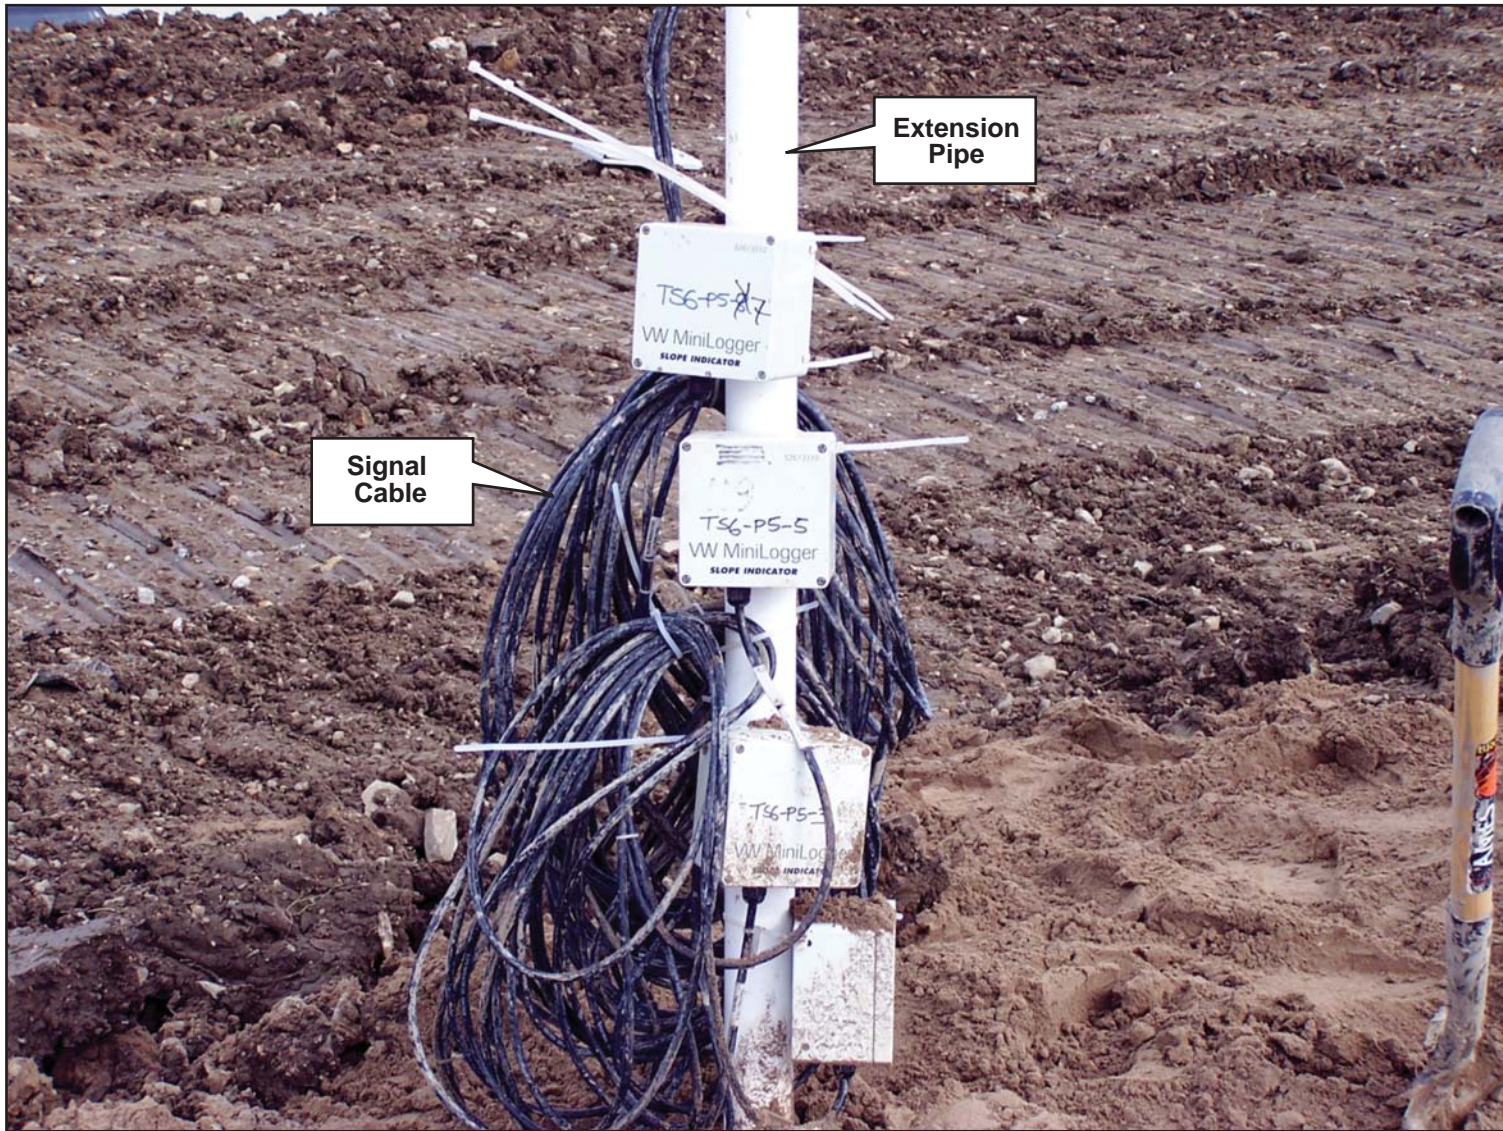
Installation of Instrumentation Sondex, Piezometers, and Settlement Plates
